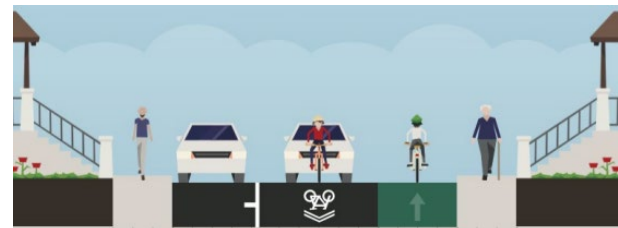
Illustration showing the proposed changes on Wallace Avenue between Lansdowne Avenue and St. Clarens Avenue, facing west.
